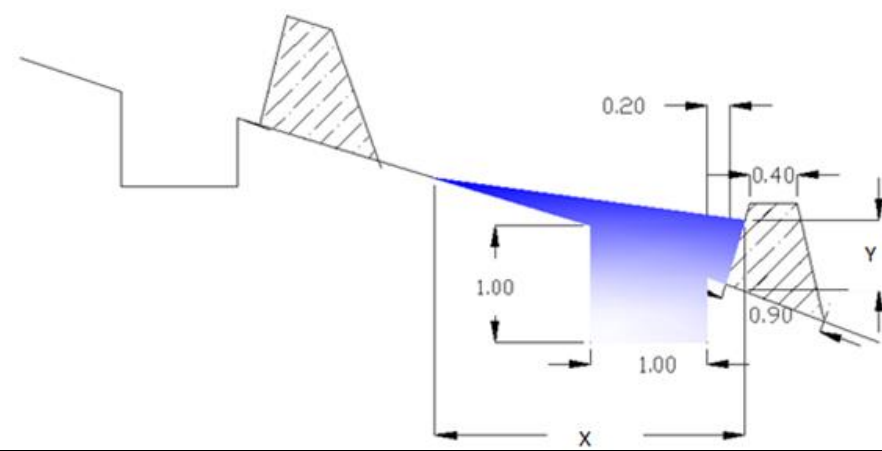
Cross sections showing standard dimensions of soil bund and burrow trench on stable soil, all units are in meter.
